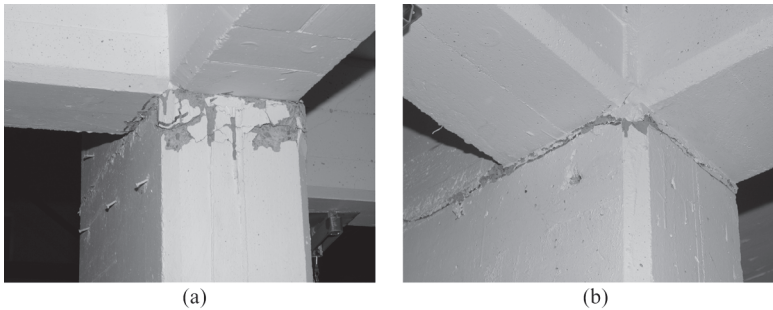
Damage on column C6 at 1st (a) and 3rd (b) storeys
